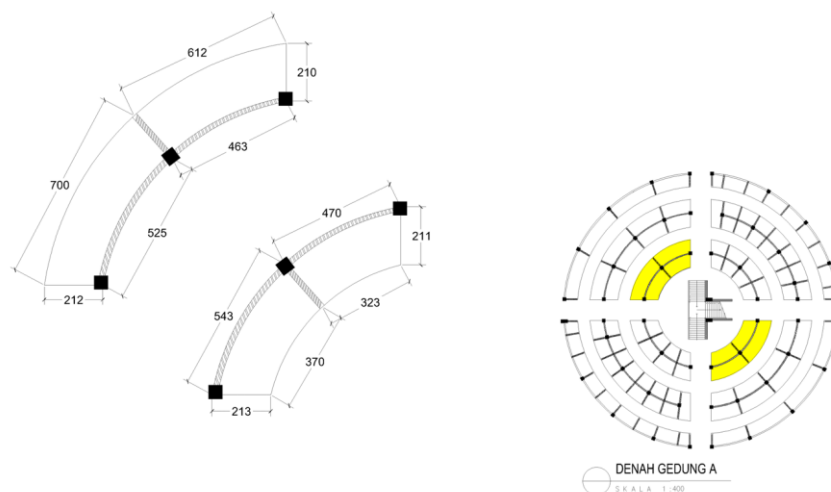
Two-Faced Two-Row Kiosk Layout Block 1 (Building A) (source: author)
